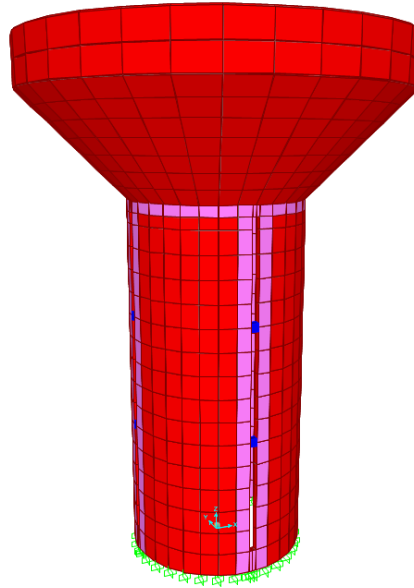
Reinforced concrete slit shaft elevated water tank
